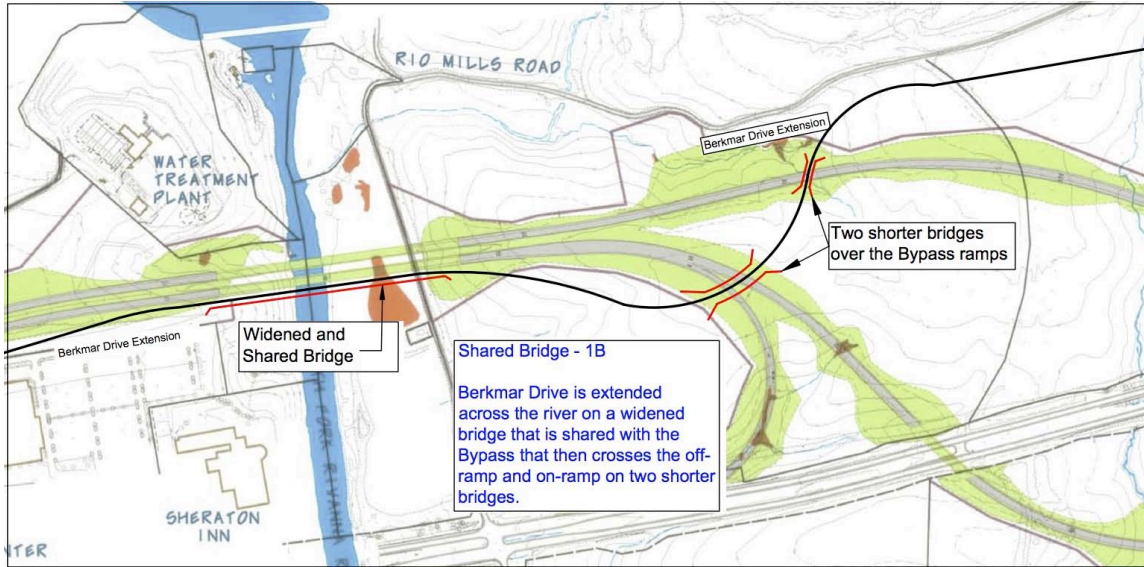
B. Shared bridge with two shorter overpass bridges over the Bypass ramps
